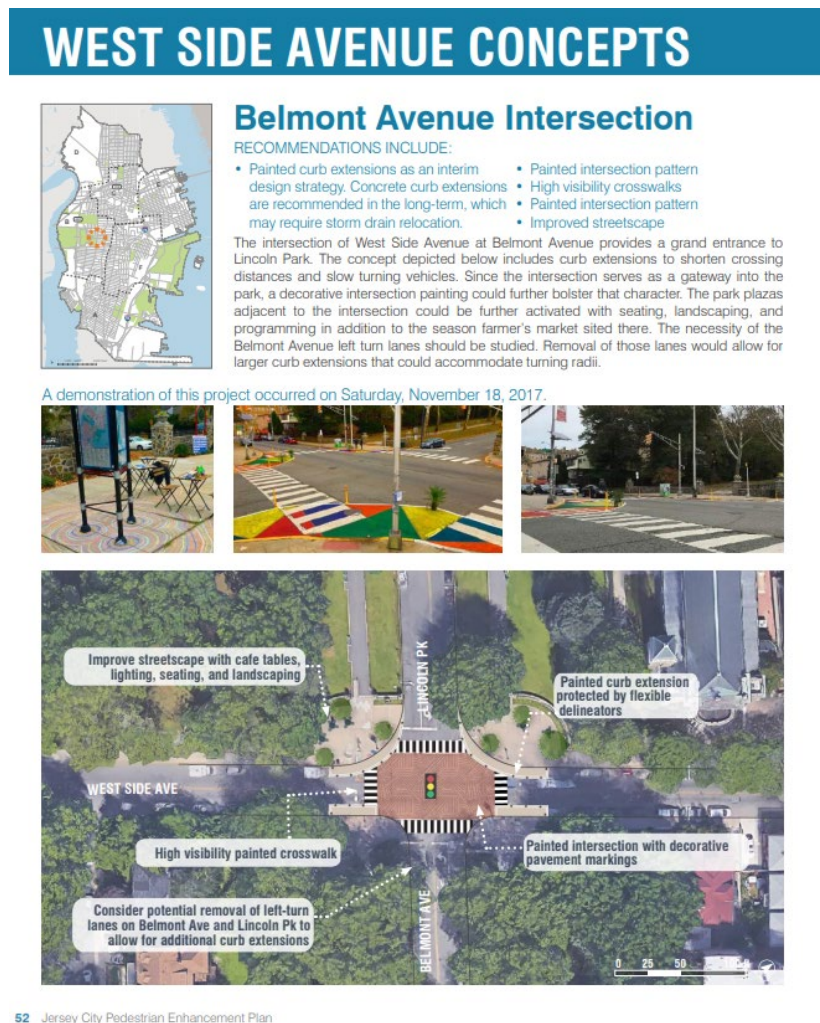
A detailed intersection improvement cut sheet in the Jersey City Pedestrian Enhancement Plan
